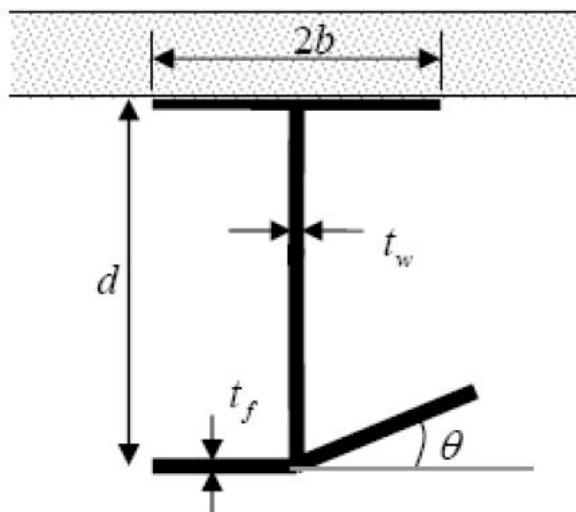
Brackmann's suggested damaged cross-section [28]
